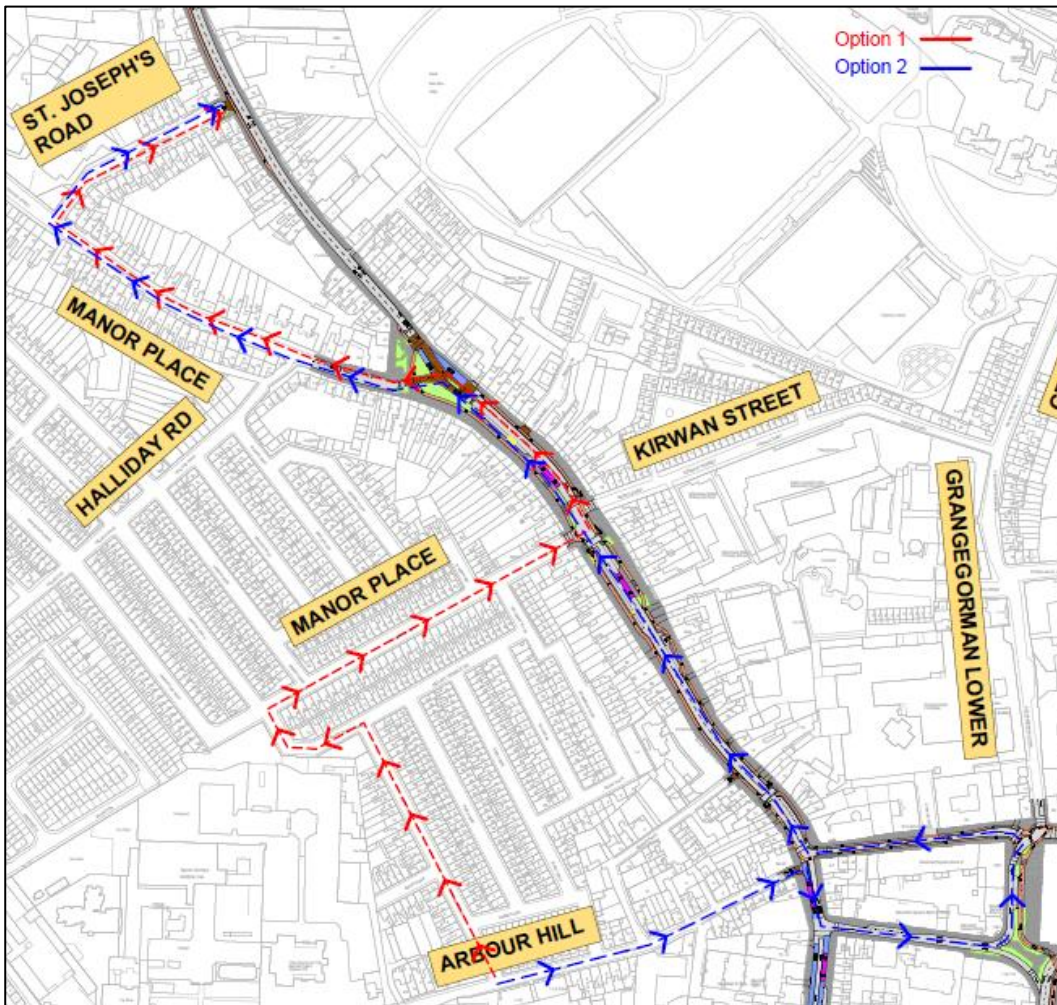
Possible access routes from Arbour Hill to Prussia Street
